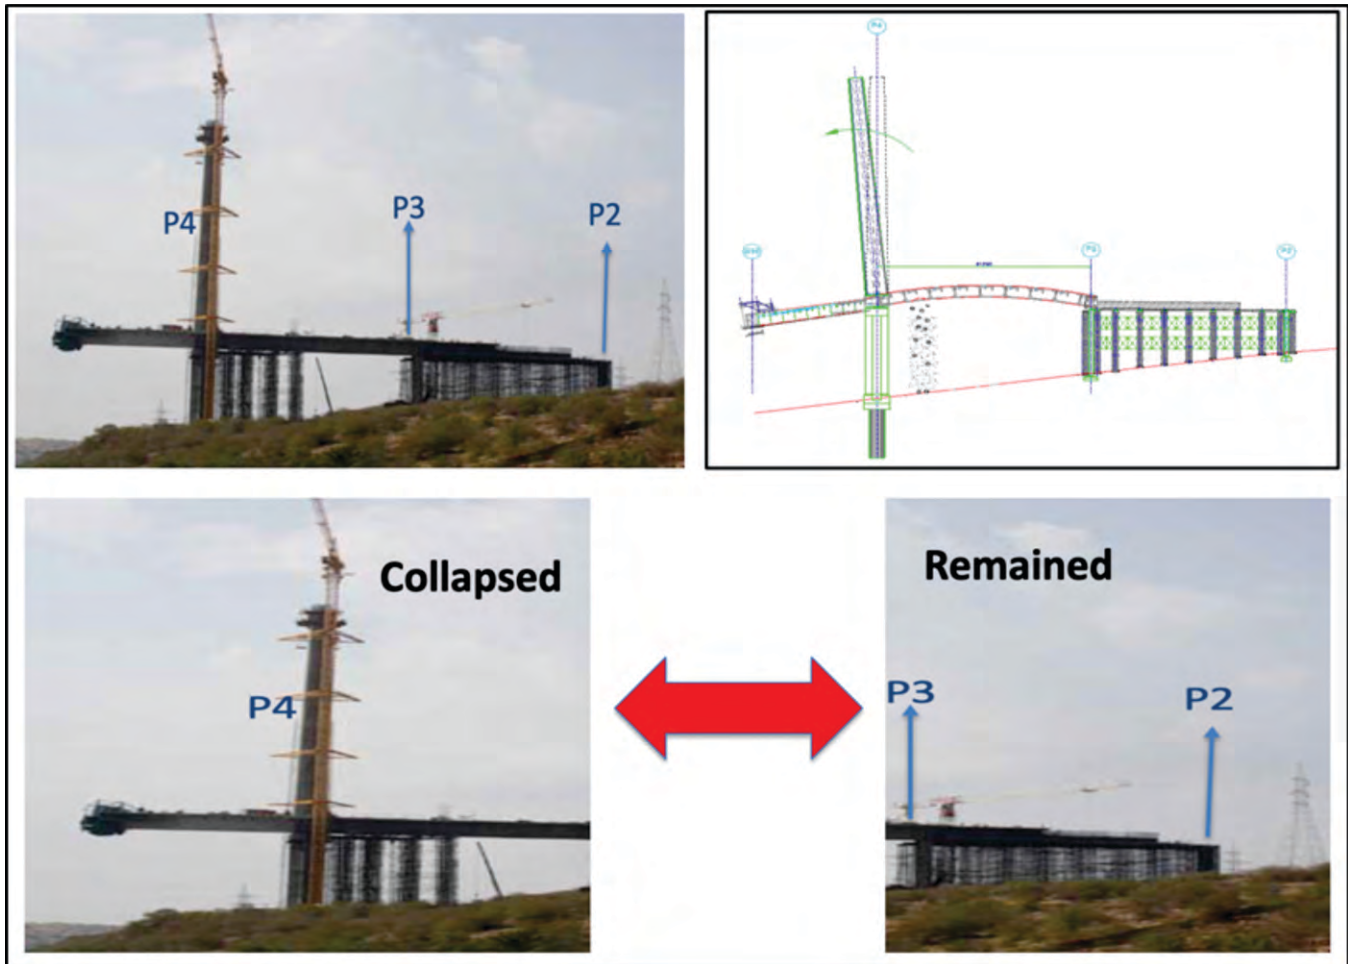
Collapse mechanism of cable stayed bridge under construction
